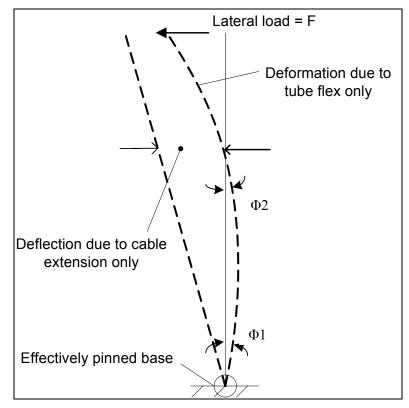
Displacements of tube due to tube flexing and cable extension.
